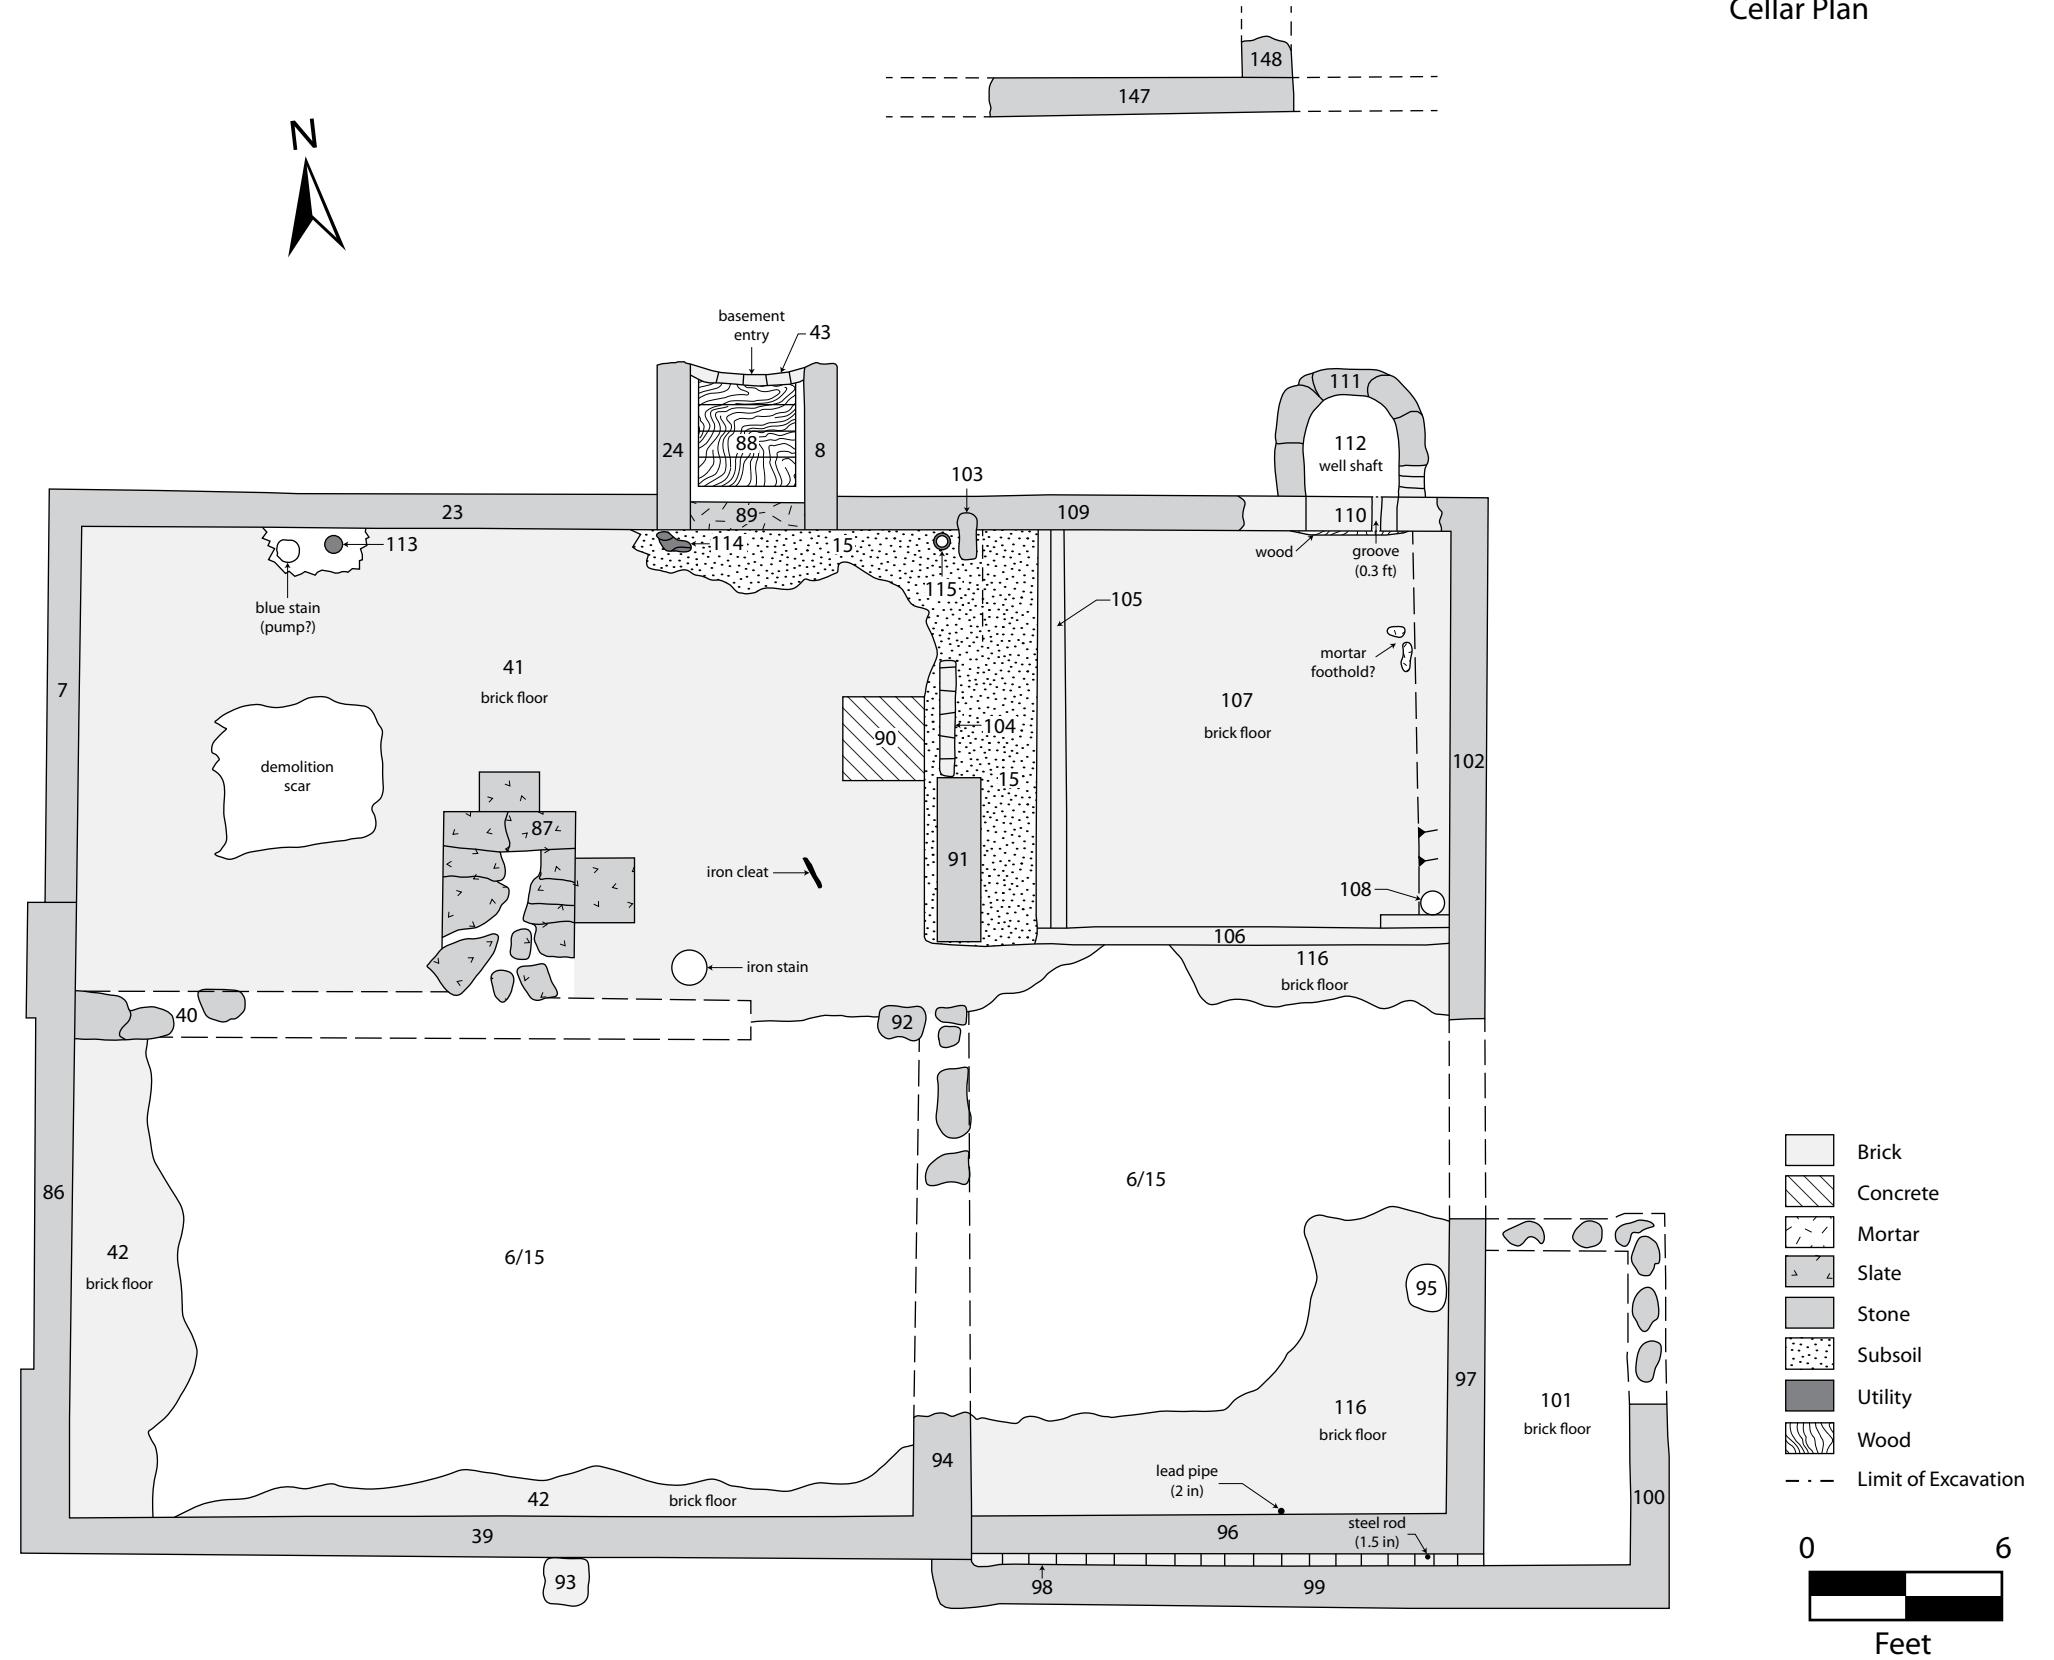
Borton/Ballinger Farmstead [28-Bu-949]: Farmhouse Cellar Plan.
